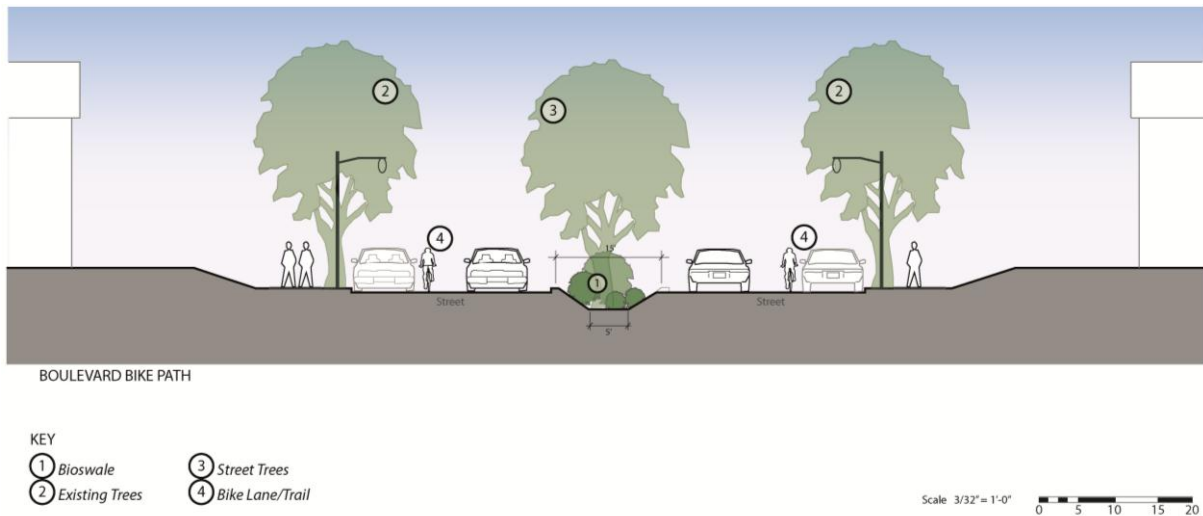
Conceptual Greenway Corridor Cross Section View on W. McKinley Boulevard from N. 27th Street to N. 34th Street
